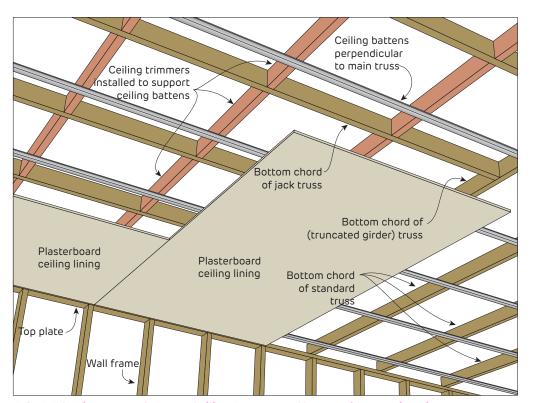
Trimmers to Support Ceiling Battens at Change of Truss DirectionPerspective
